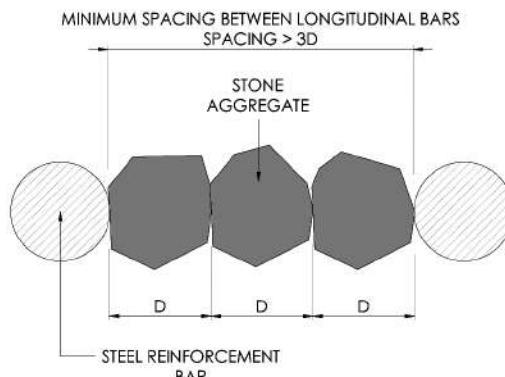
A Sketch Showing Minimum Spacing Required Between Reinforcing Bars
